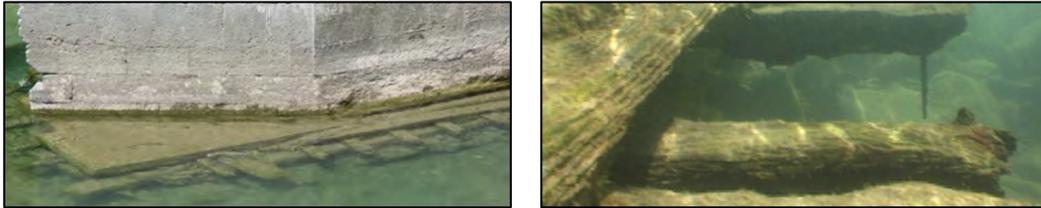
The wooden grates forming the foundation of the bridge abutments.
